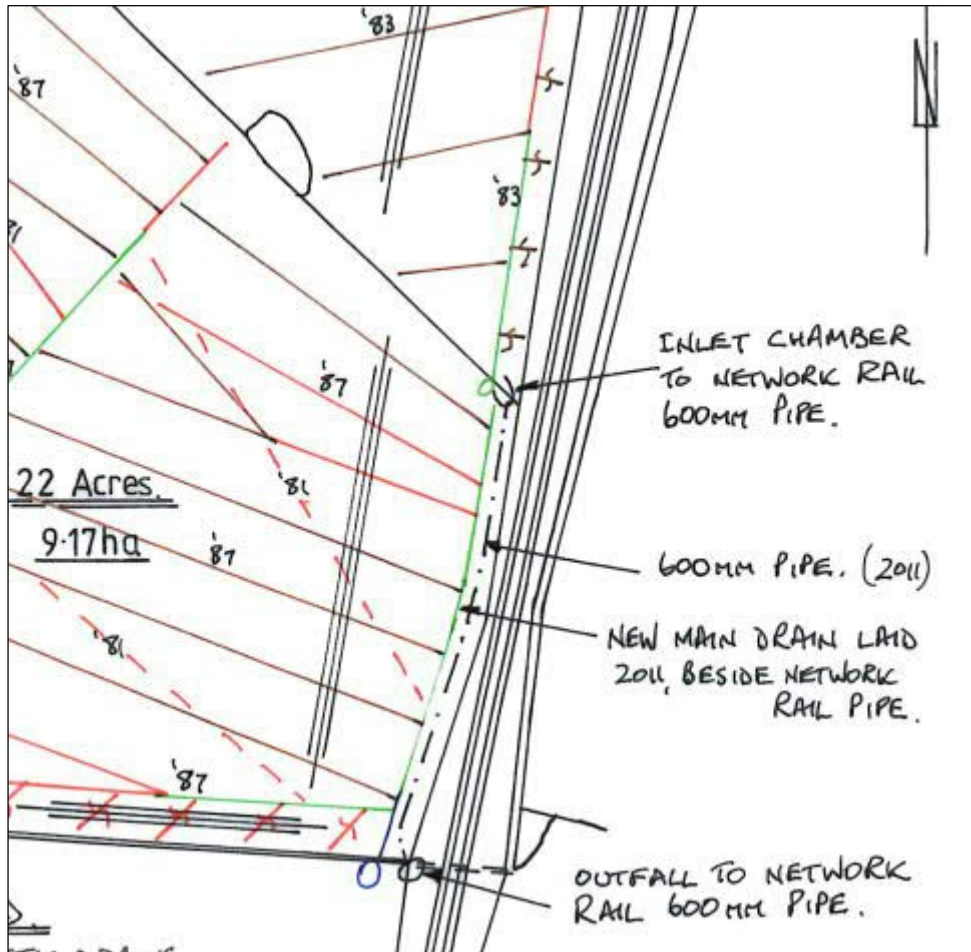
Local watercourse south of Sizewell link road outfall through East Suffolk Railway land
